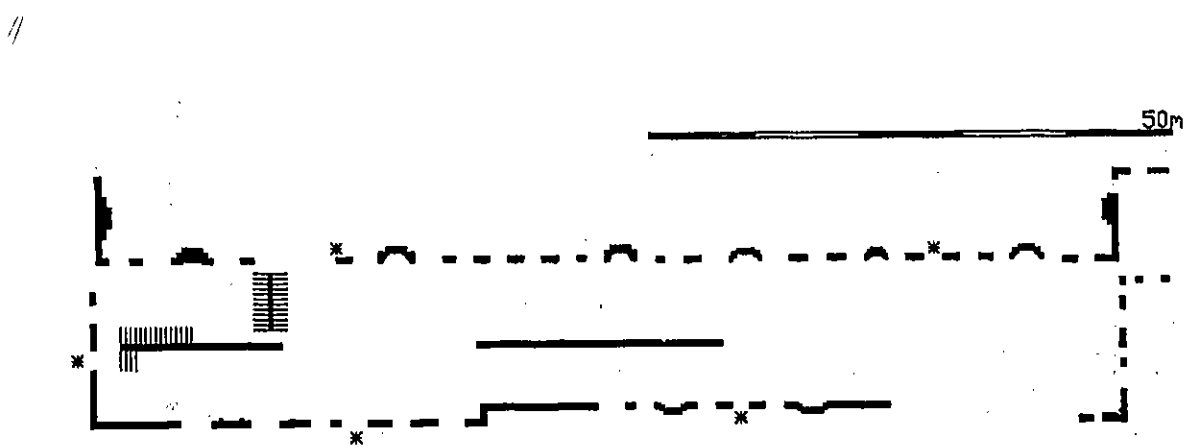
Jigginstown House, Naas, Co. Kildare. First Floor Plan.
